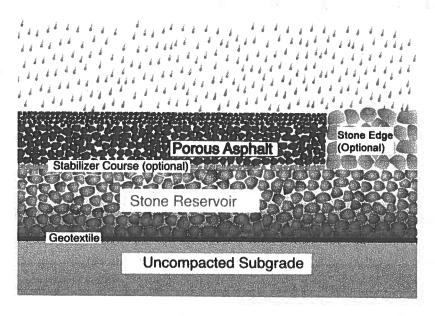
Typical porous asphalt pavement with stone reservoir cross section
